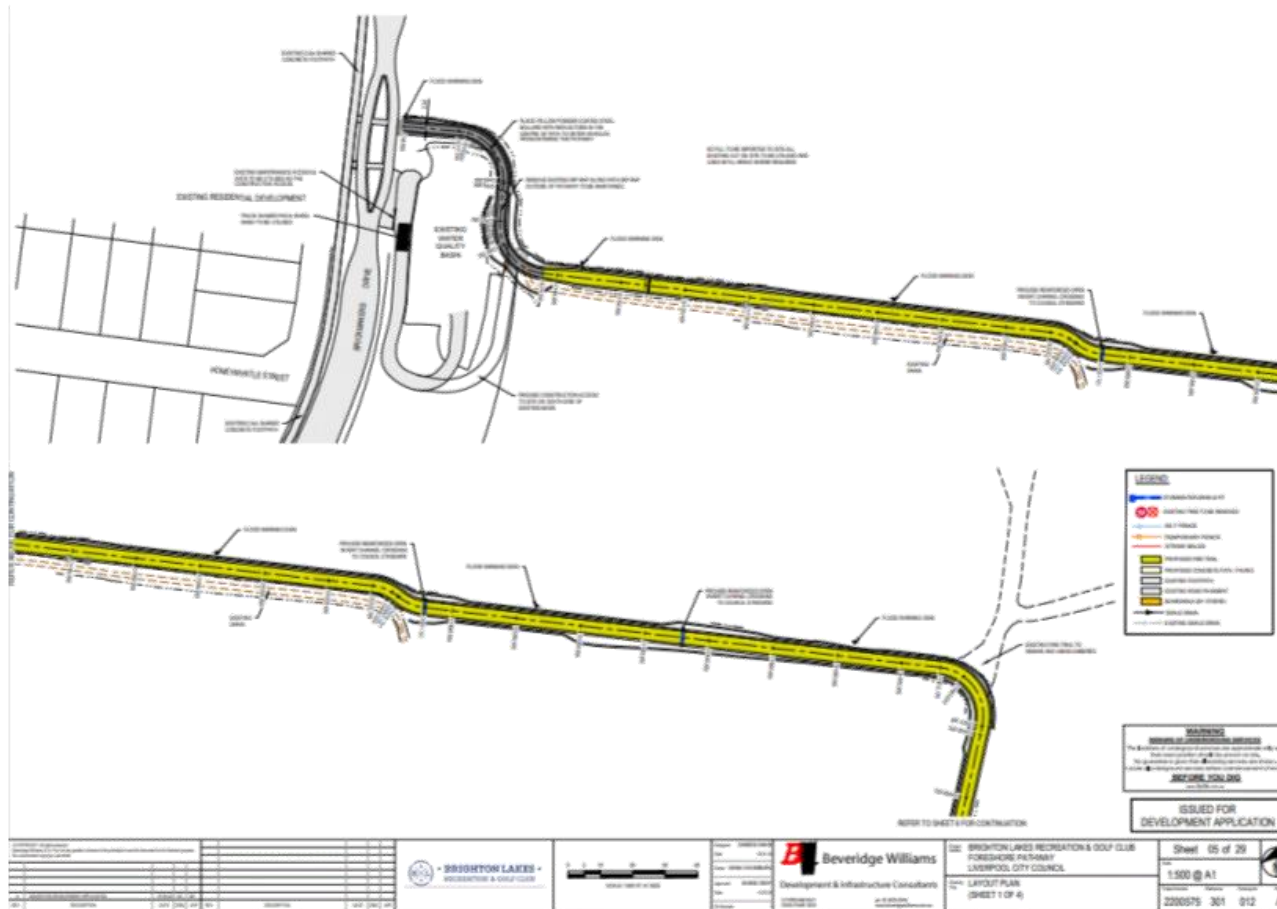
B - A schematic indication of the elements of the proposed pathway construction in Stage 1 along the current fire-trail route from Brickmaker's Drive, Moorebank (for detail see Beveridge Williams layout plans 2024)
